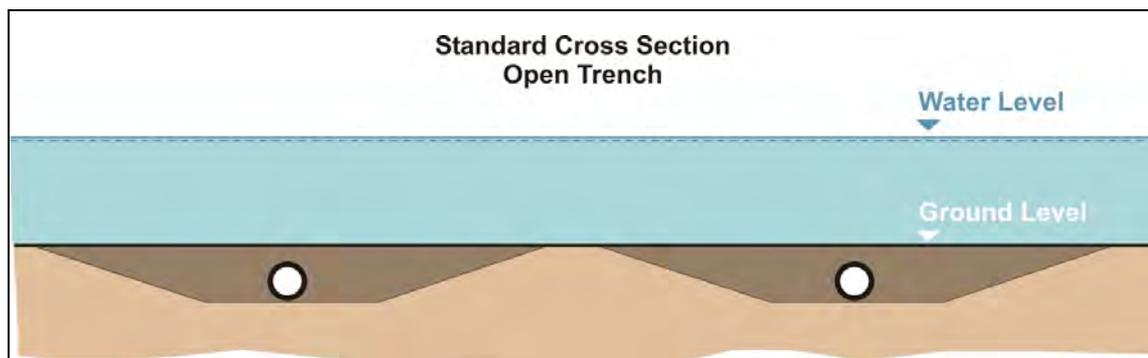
Standard cross section – open trench in the Russian landfall area
